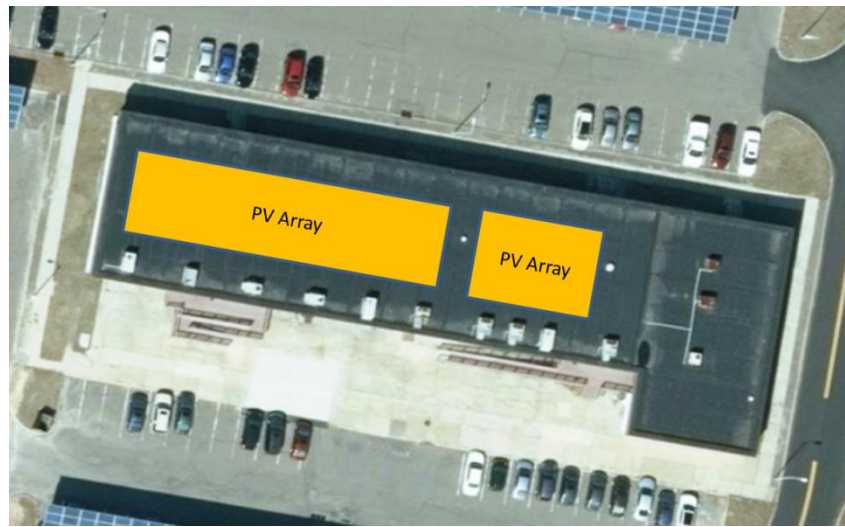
Roof of Modular Building- Heath with possible PV array arrangement.
